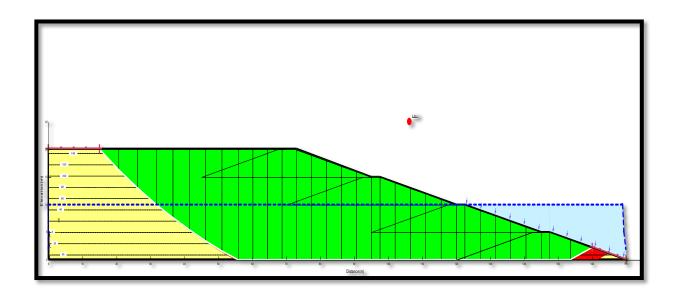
Embankment cross section for 1:4.5 slope at 5 m water level
